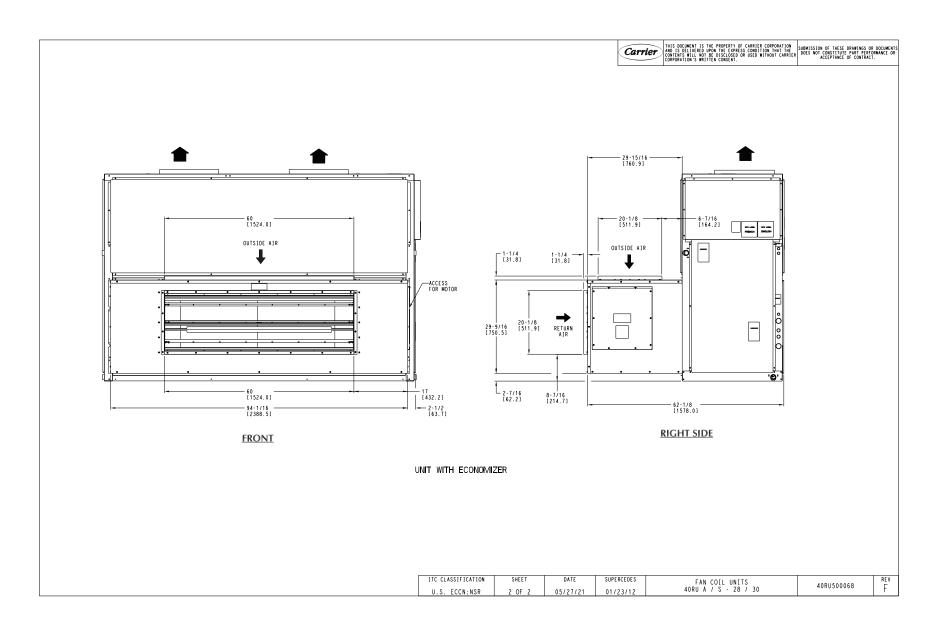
Dimensions — Sizes 28 and 30 (cont)
